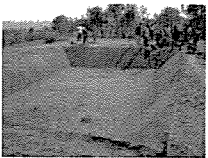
Plan of Operation for Farm Pond Construction
